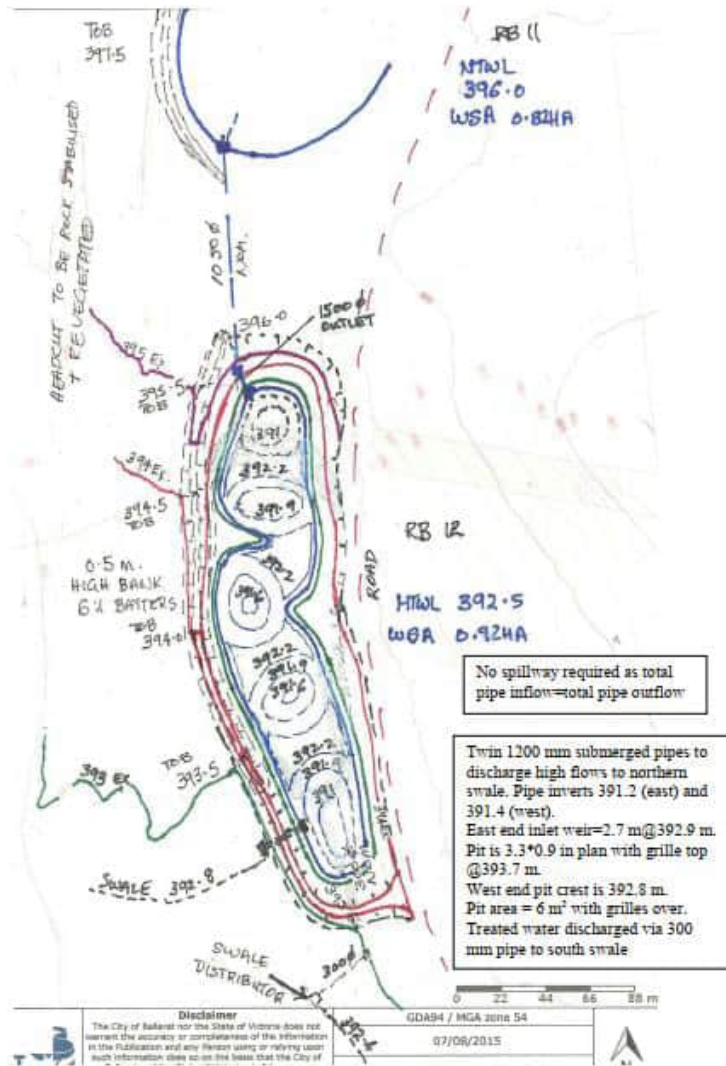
RETARDING BASIN 12 LAYOUT
